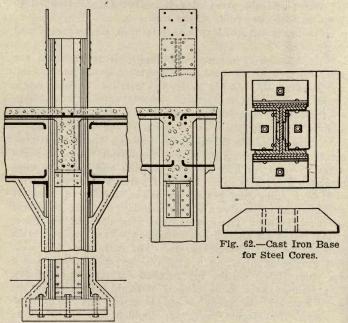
Steel Core Column Footing and Bracket for Beam and Girder Connection.
